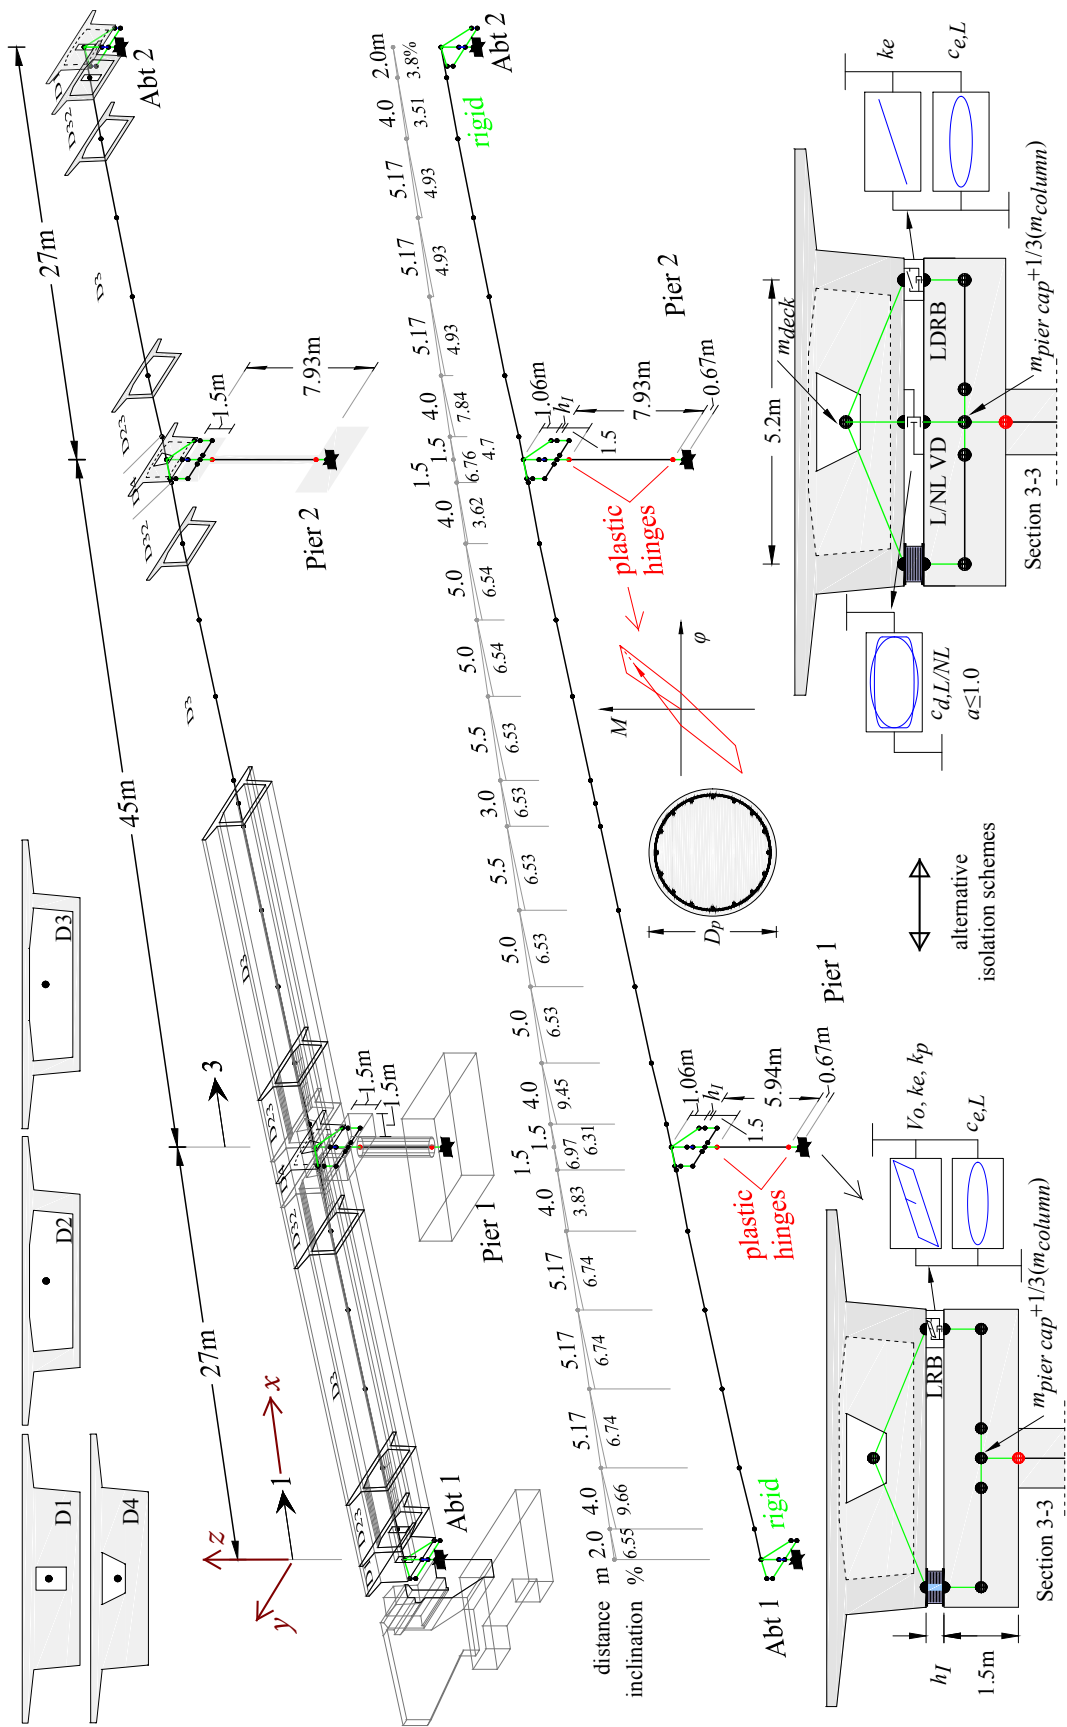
Layout of the bridge configuration and finite element modelling
